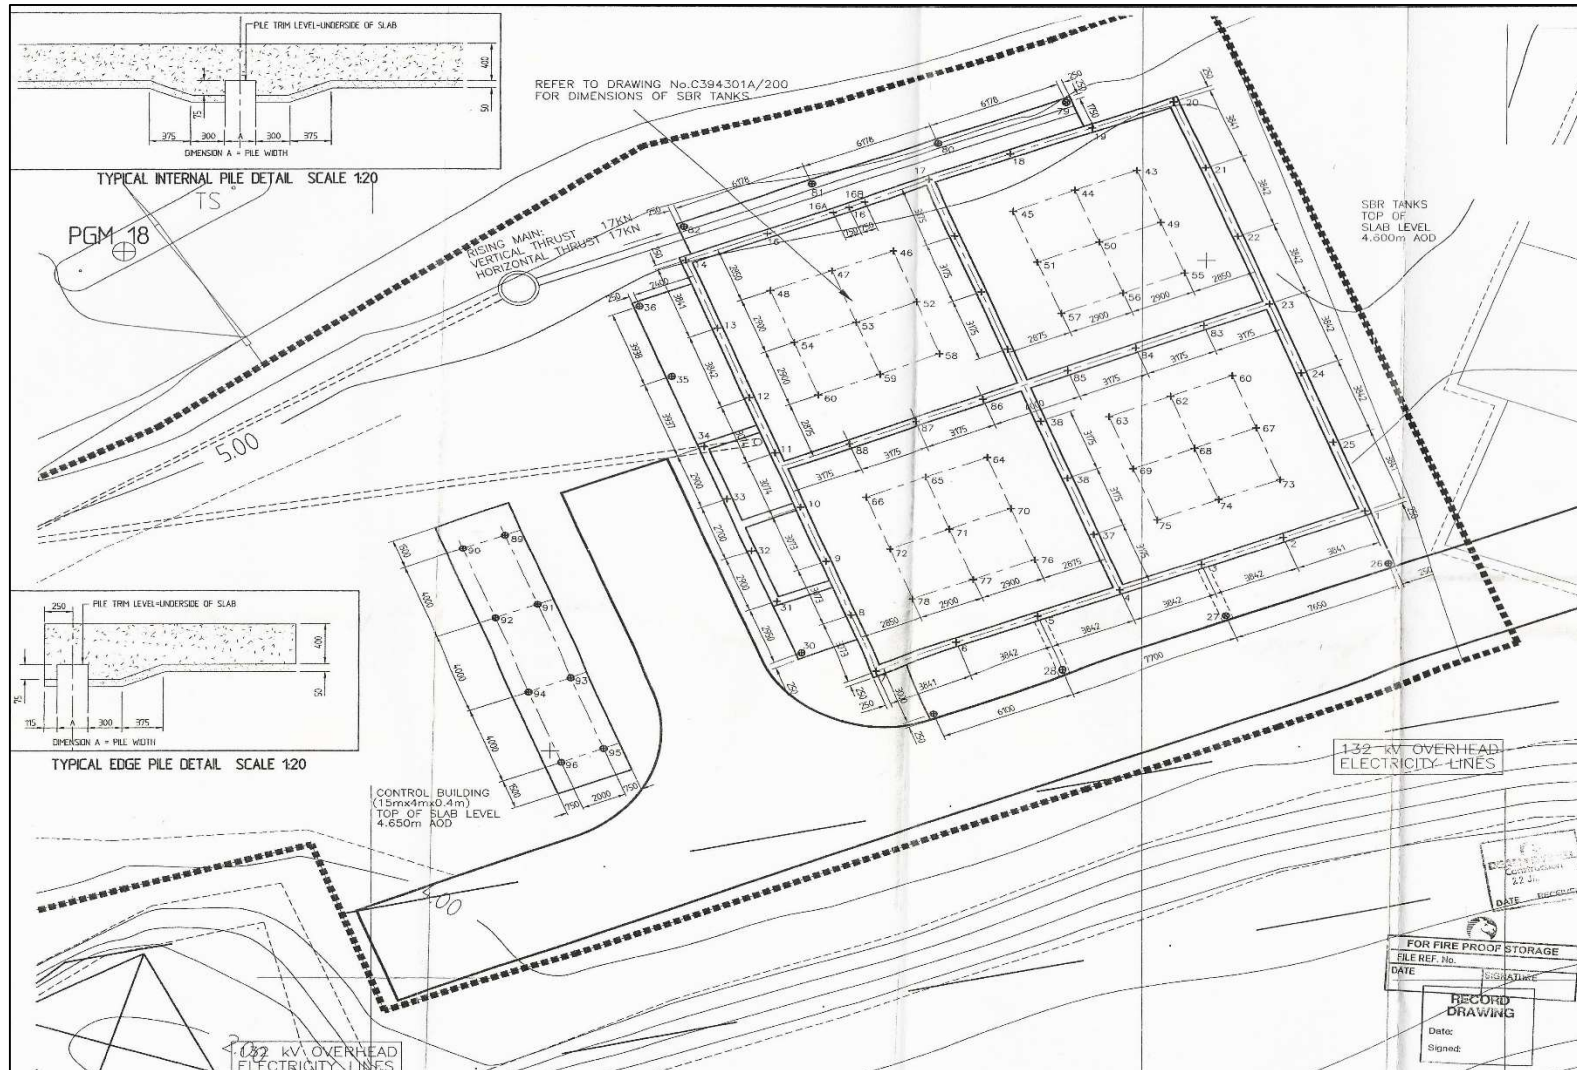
Pile foundations constructed during the installation of the SBRs
